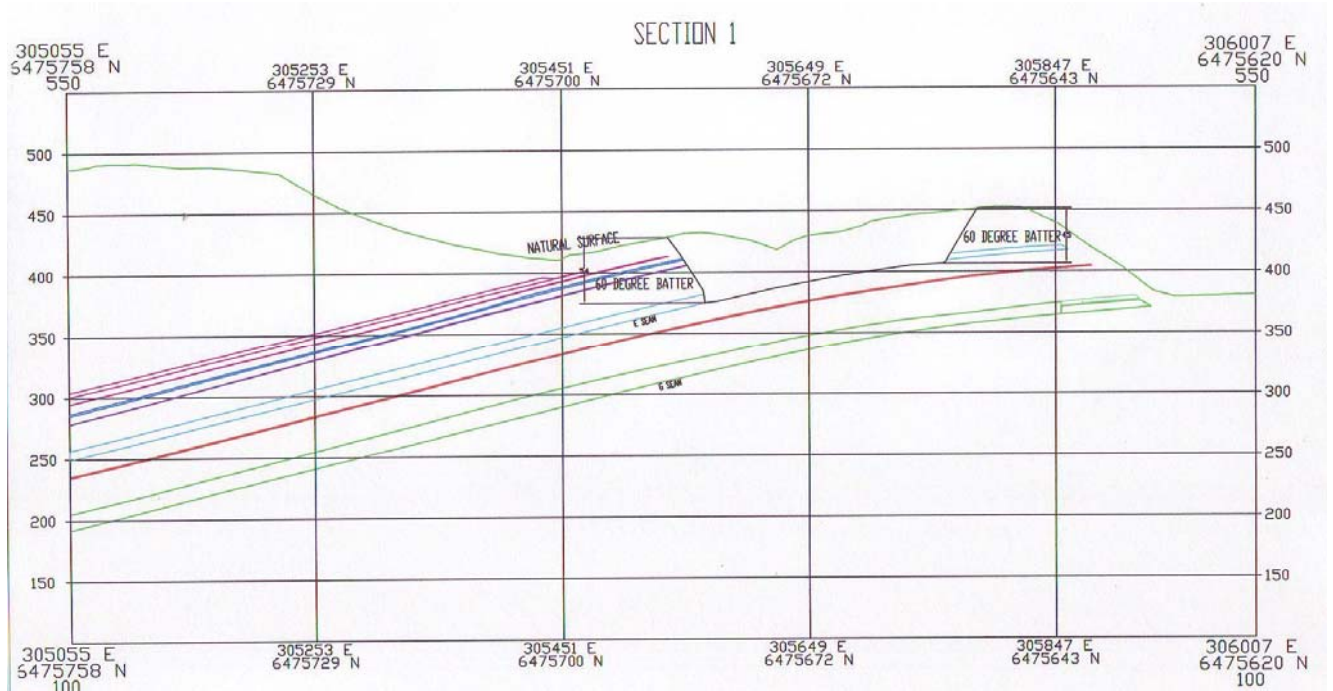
Cross section 1 through pit at northern end of pit closest to Pages River
